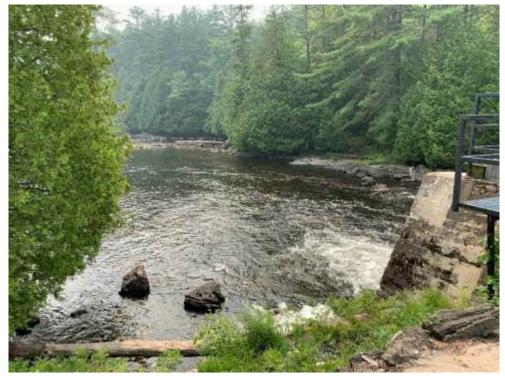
Existing conditions of Kashwakamak Lake, downstream of the dam structure. Facing east
